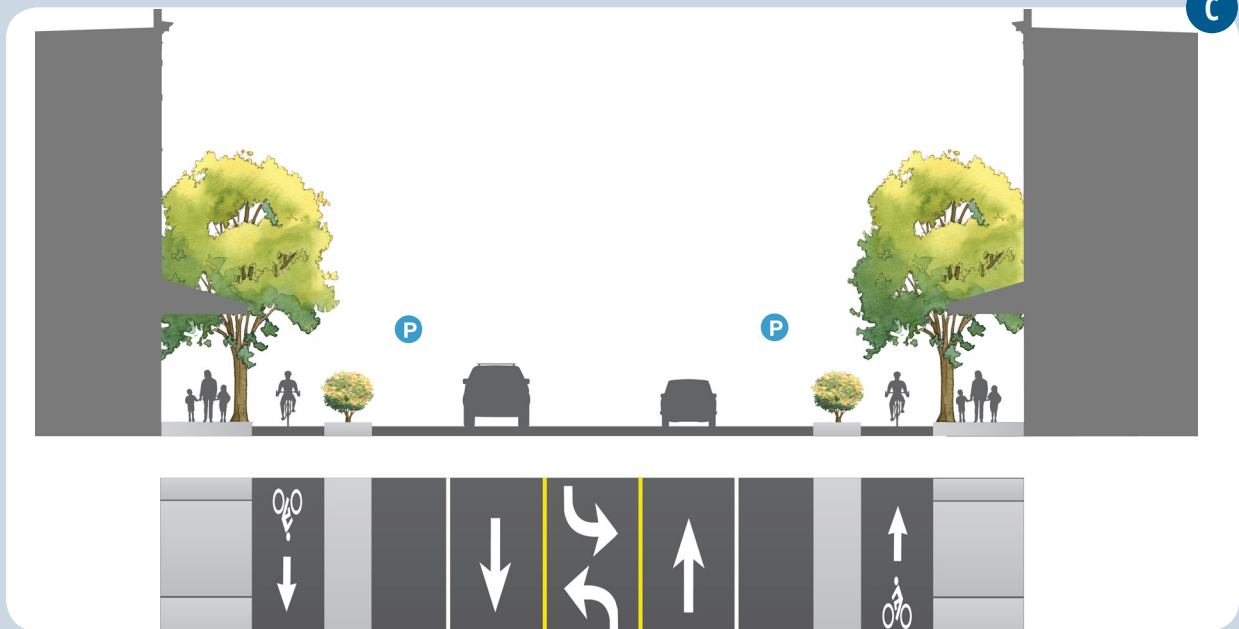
A Street (Between Foothill Blvd and 2nd Street) Proposed Improvements
